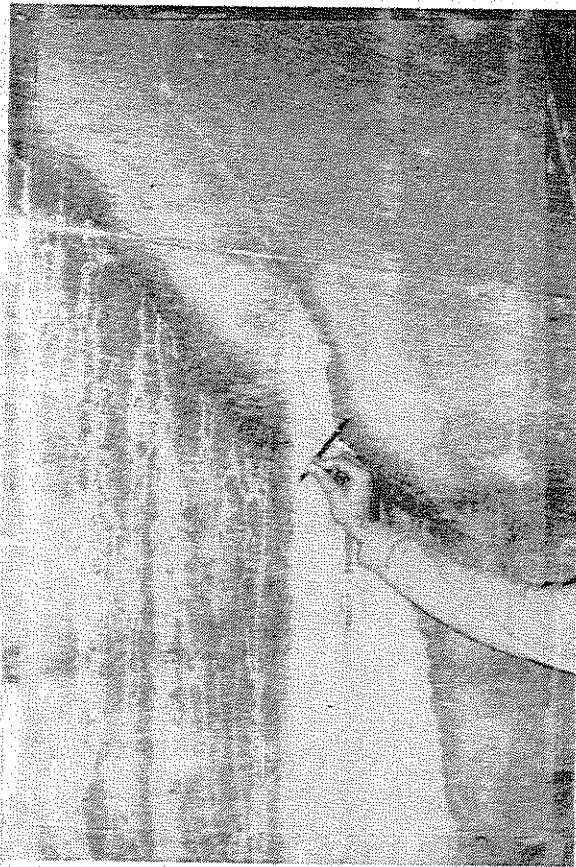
Vertical Crack in the Exterior Wall of B-976
